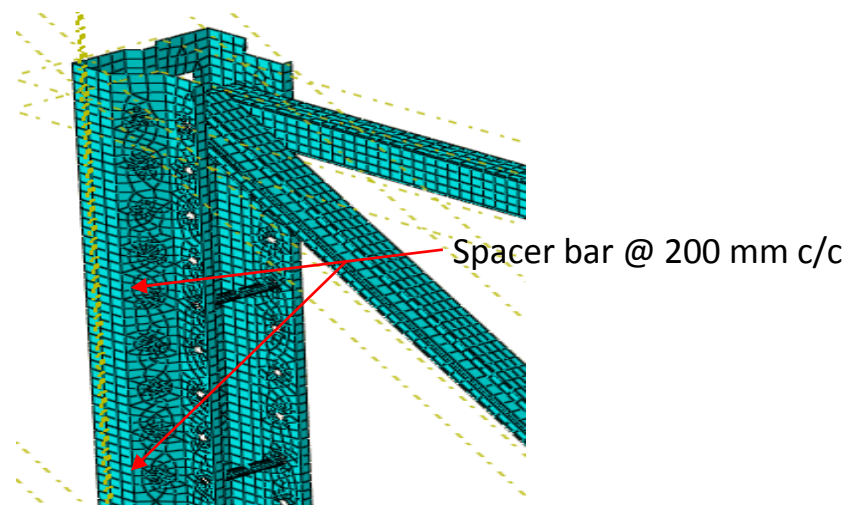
Typical meshing of column section and details of joint of frame with spacer bar @ 200 mm c/c
